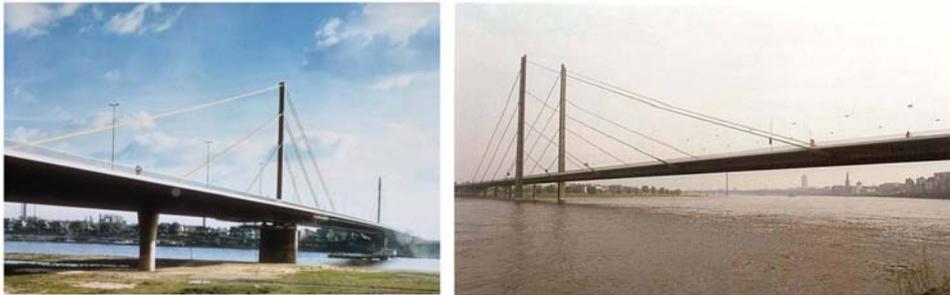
Neuenkamp Bridge (left) and Knie Bridge
